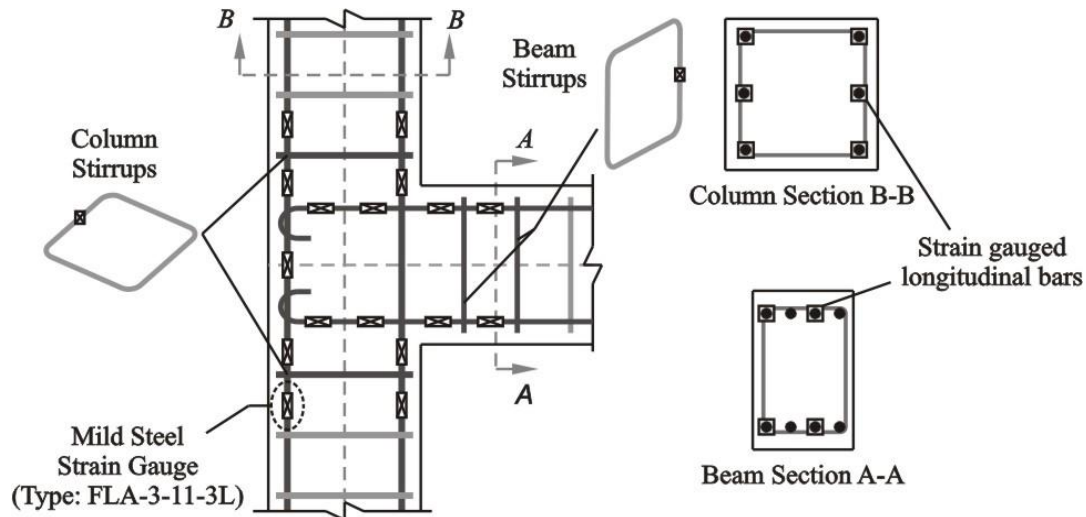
Layout of reinforcement strain gauges in 2D specimens
